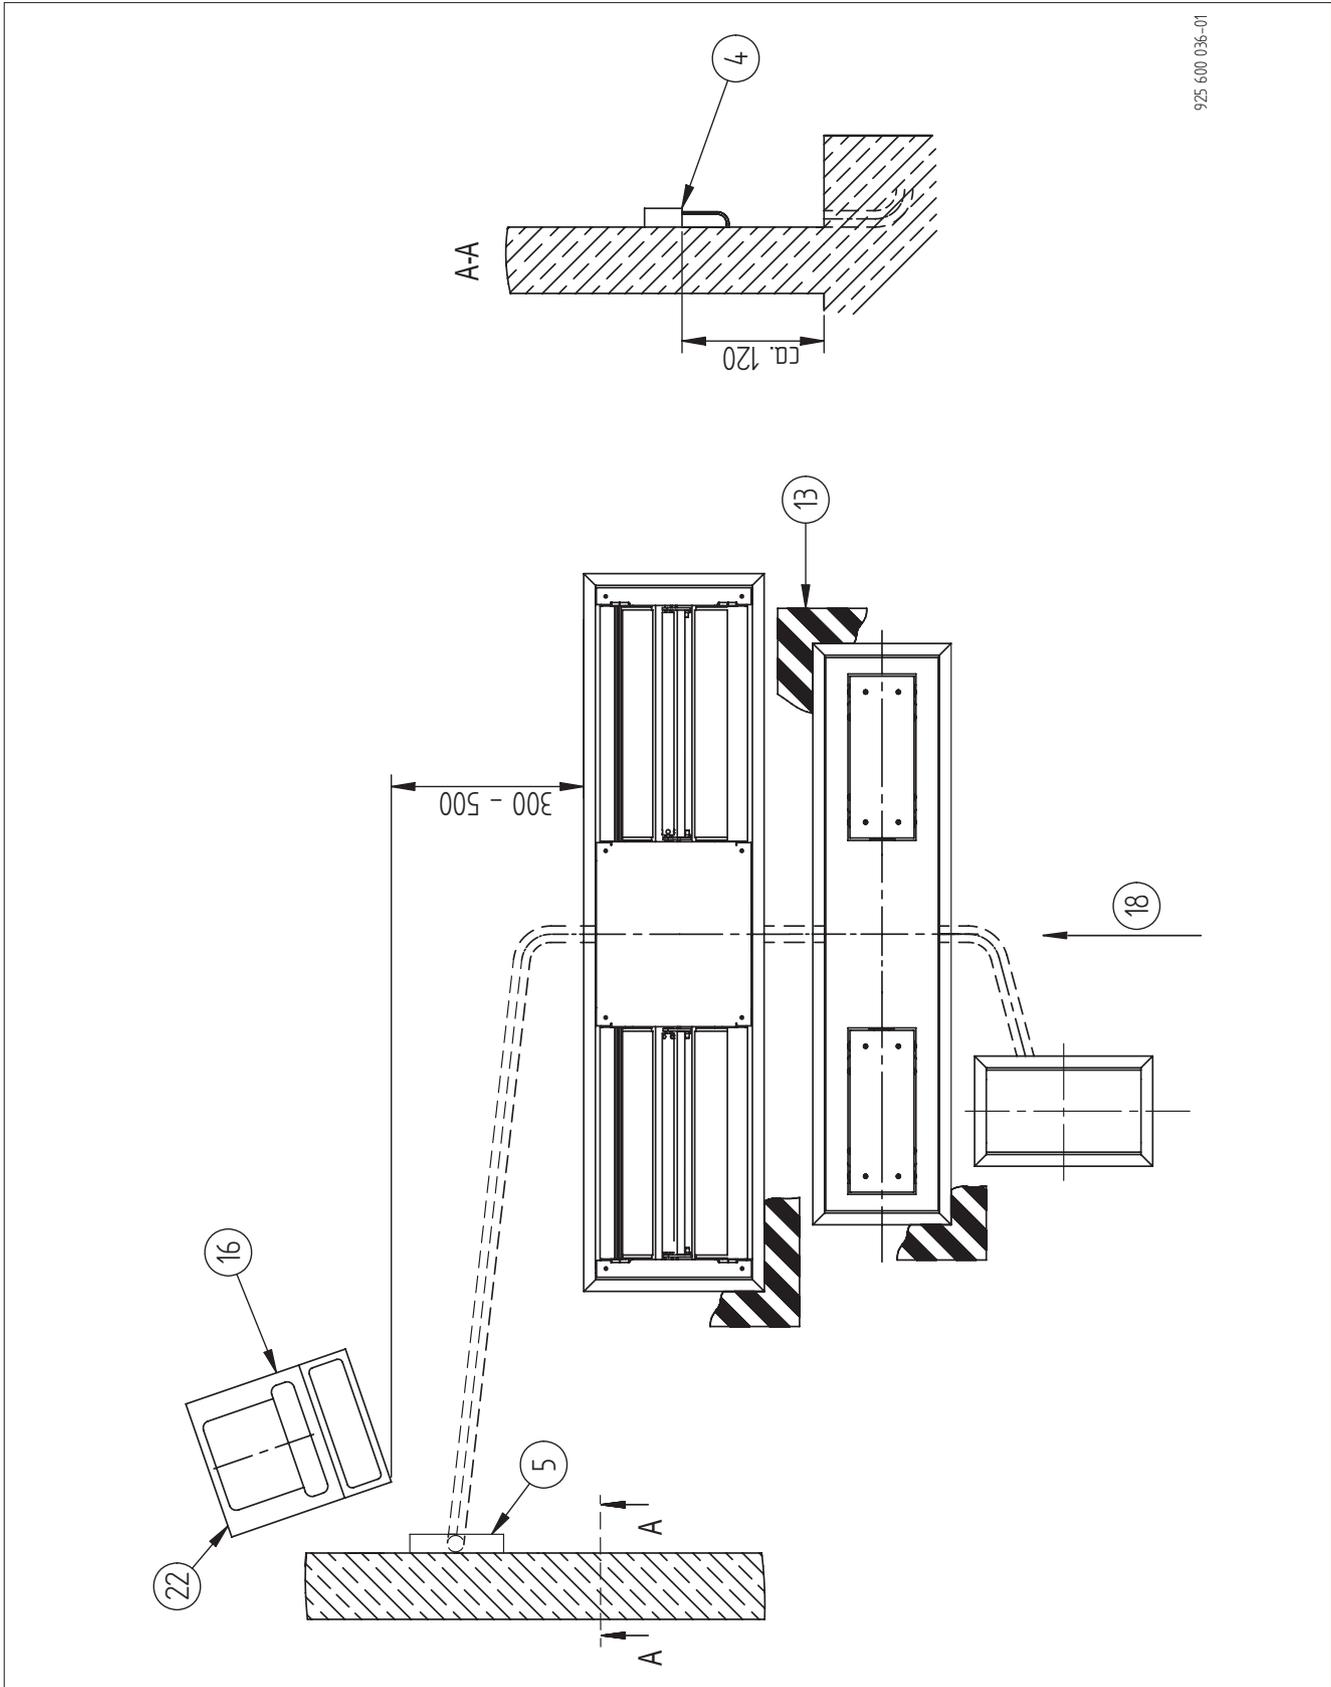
Installation plan BD 660 with PC, suspension tester and side slip tester - Overview
